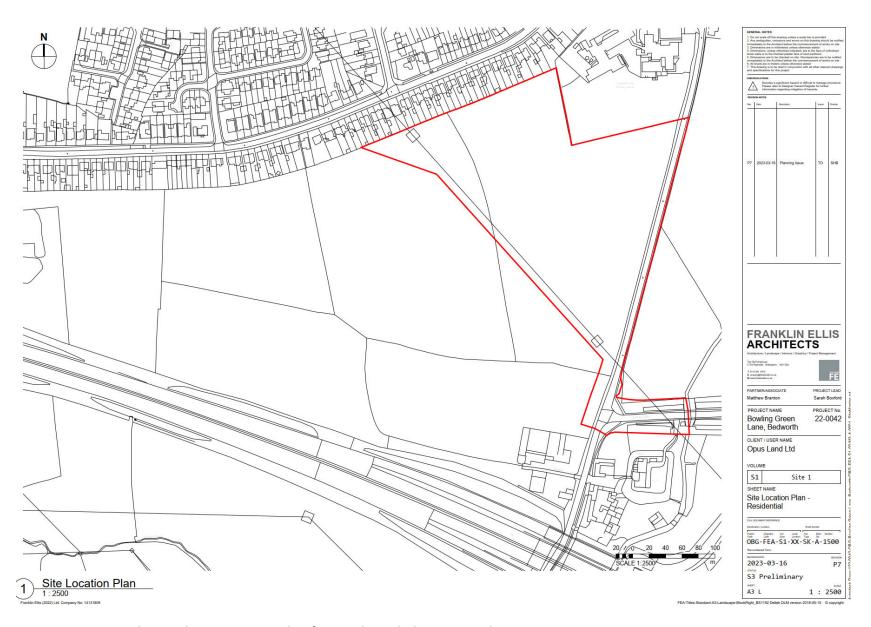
Submitted Site Location Plan for residential planning application 039592
